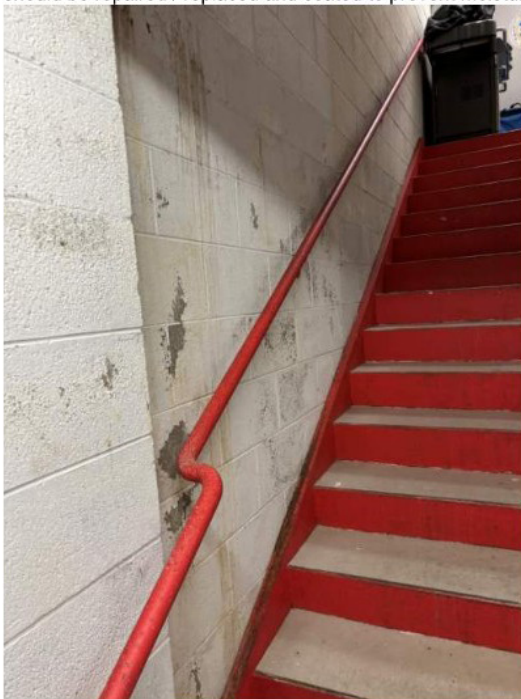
North Basement wall: Note evidence of inadequate waterproofing below grade on this north wall.
